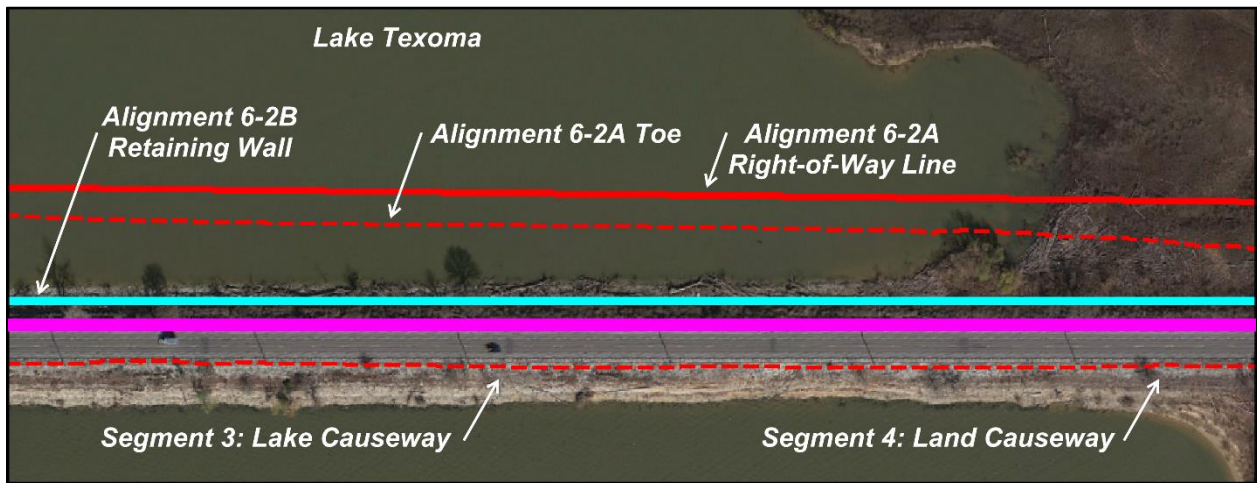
Segment 3 & 4 - Proposed Retaining Wall (Plan)
